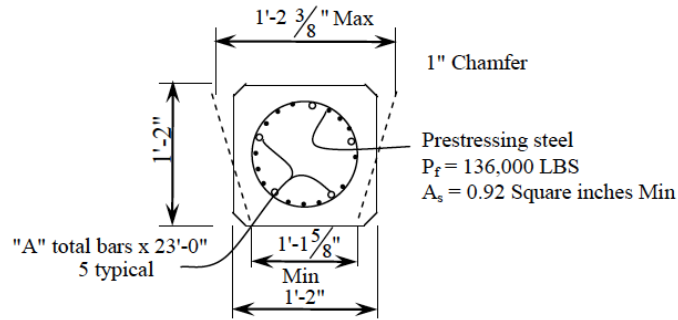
Cross section of prestressed concrete piles (Fanous, et al. 2010).
